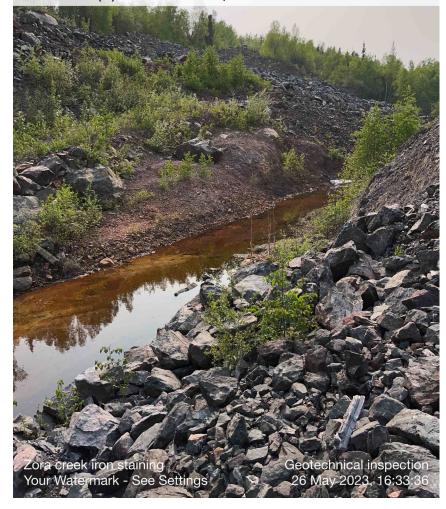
View from level crossing looking upstream towards Zora Lake (May 2023)
